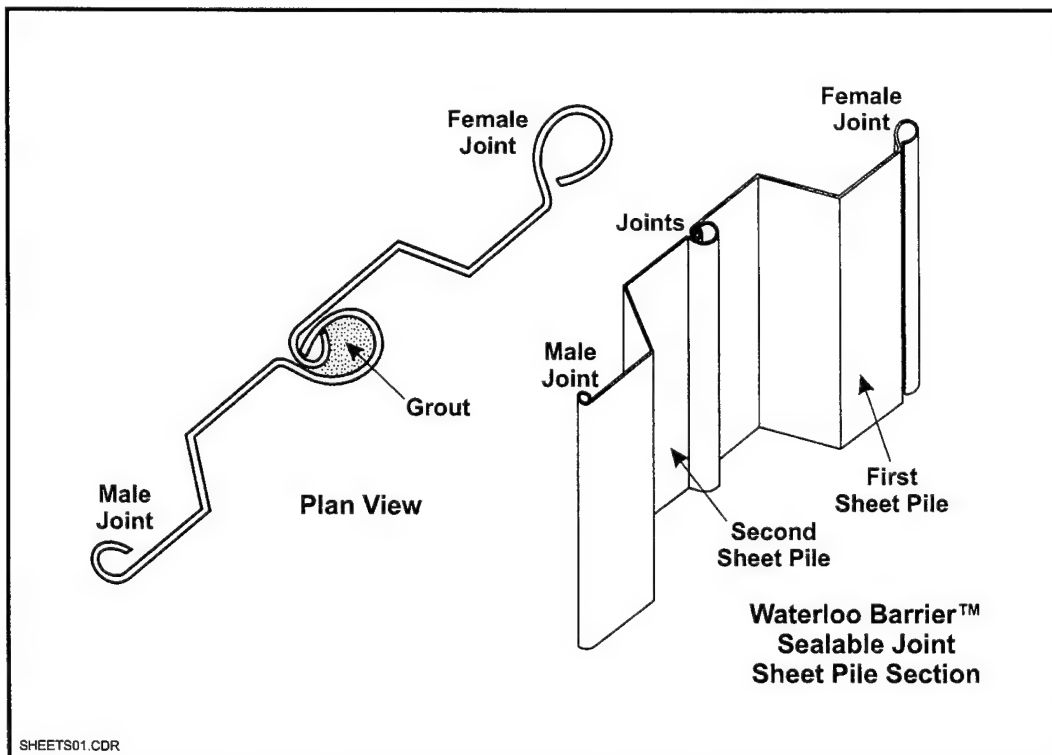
Sealable-Joint Sheet Pile Barrier
